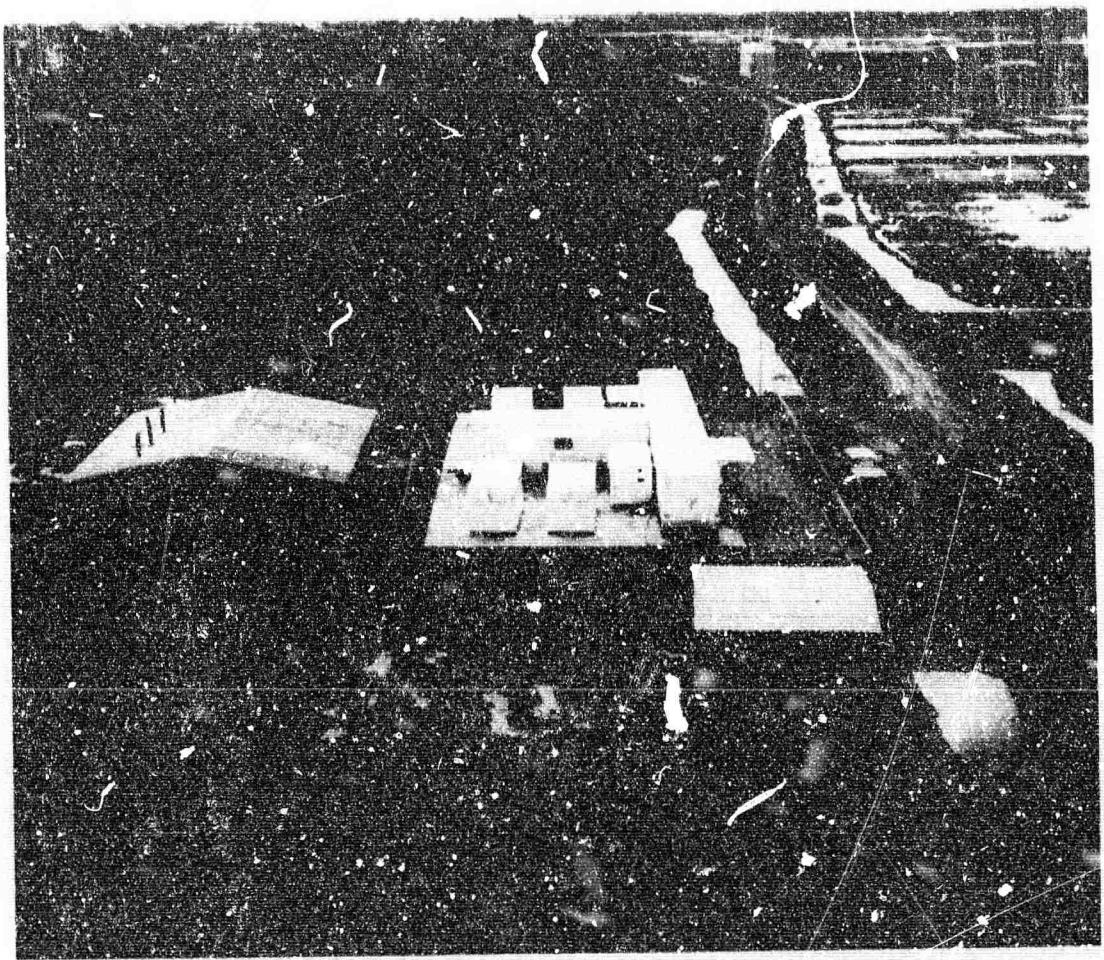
PHOTOGRAPH OF T-VAN COMPLEX AND POWER BUILDING
